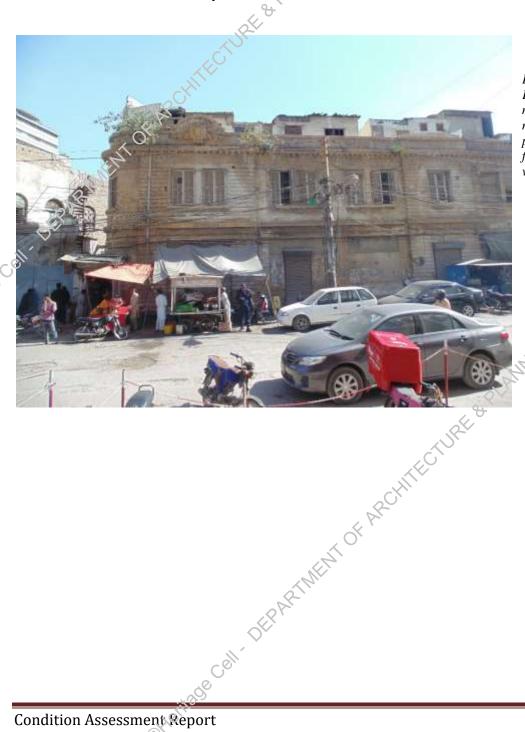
Front Façade- loose stone masonry can be noted at many places. Additional floor on top is also
